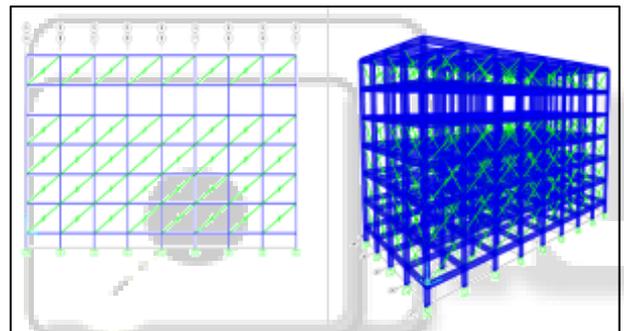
Elevation & 3D View of G+5 soft storey at fourth floor.
